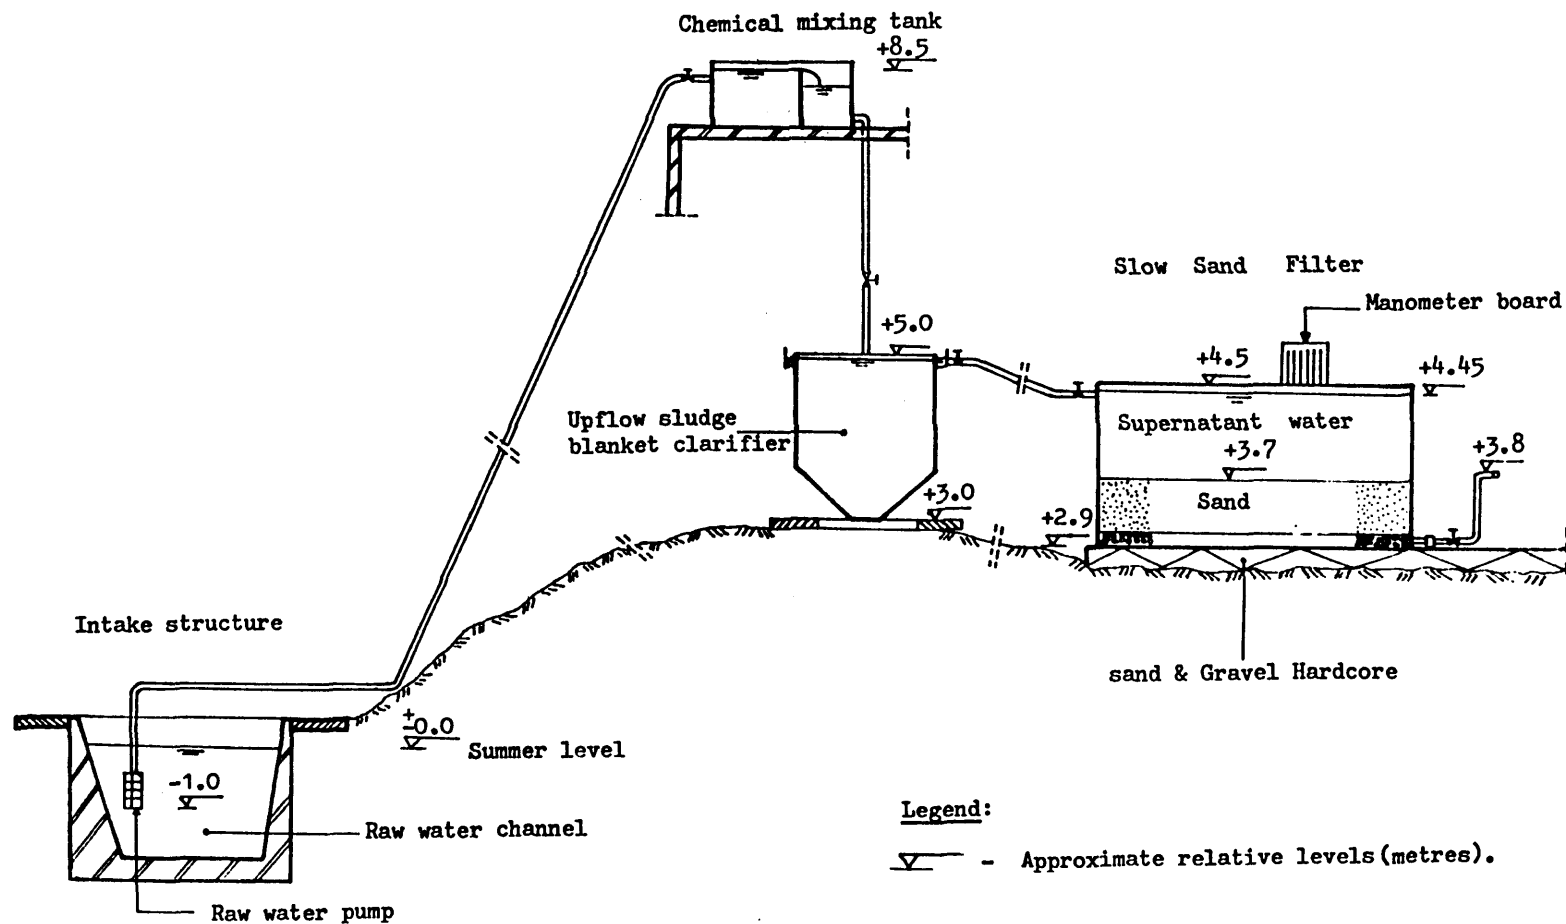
Schematic hydraulic profile of Egham pilot plant.
